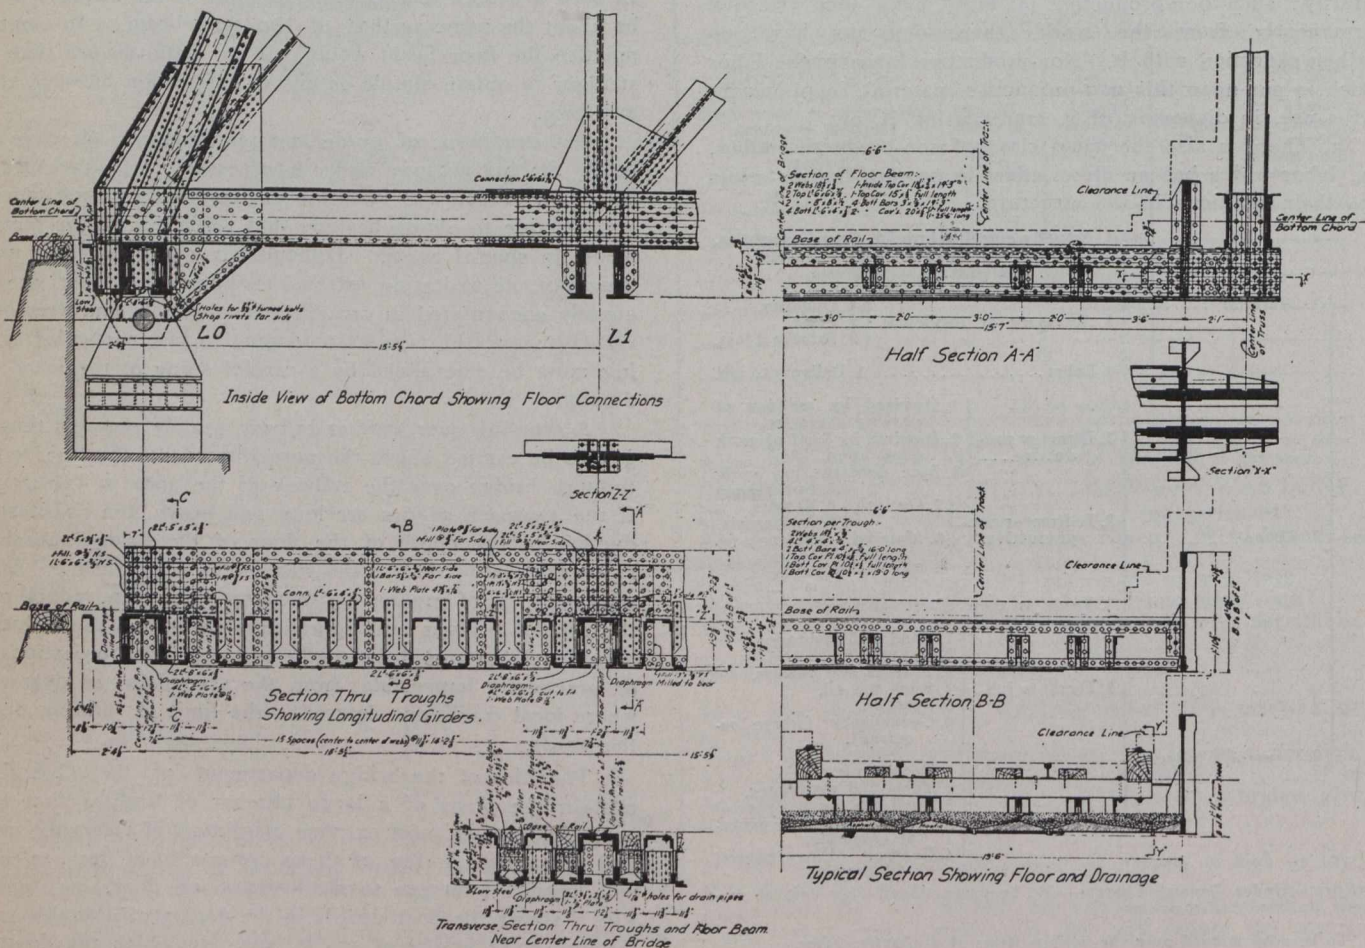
General Details of Shallow Trough Bridge Floor.
